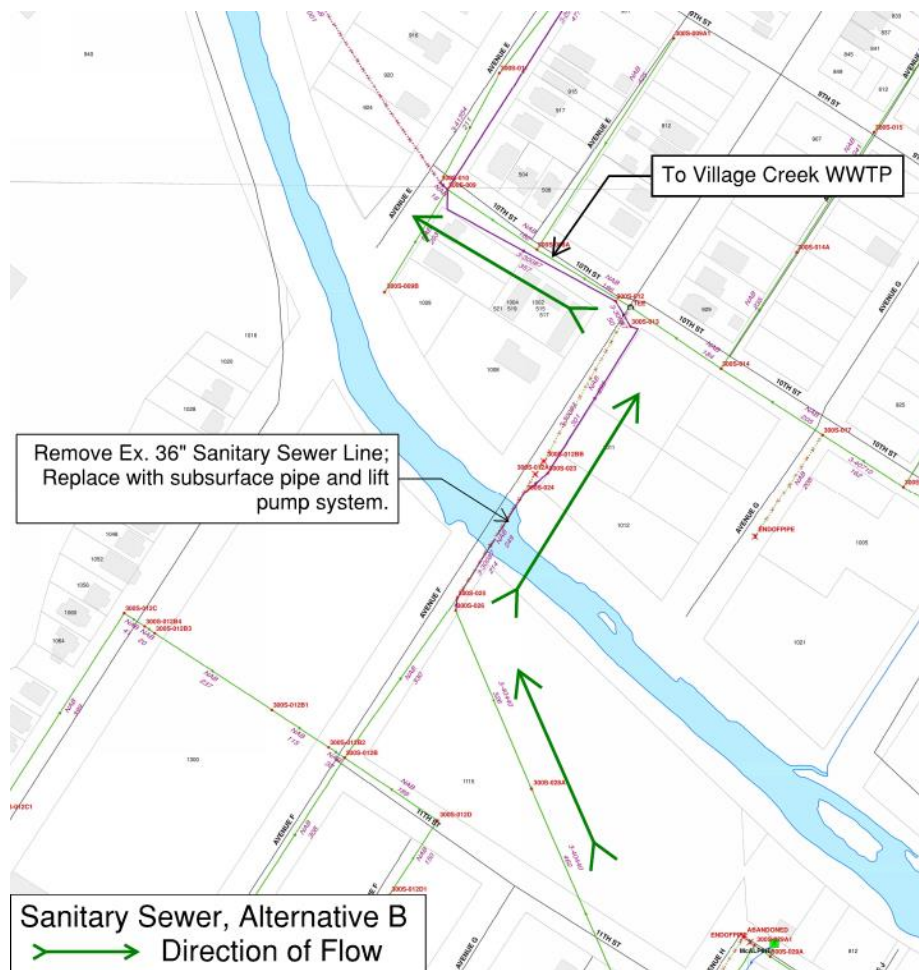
Proposed Sanitary Sewer Alternative B; Also see Exhibits for plan and profile of Alternative B.
